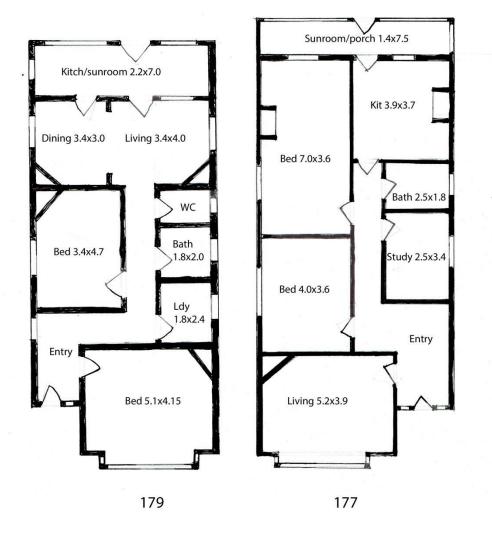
Floor plans of 177-179 Campbell Street (street to bottom of plan, note doors and windows not necessarily to scale.
